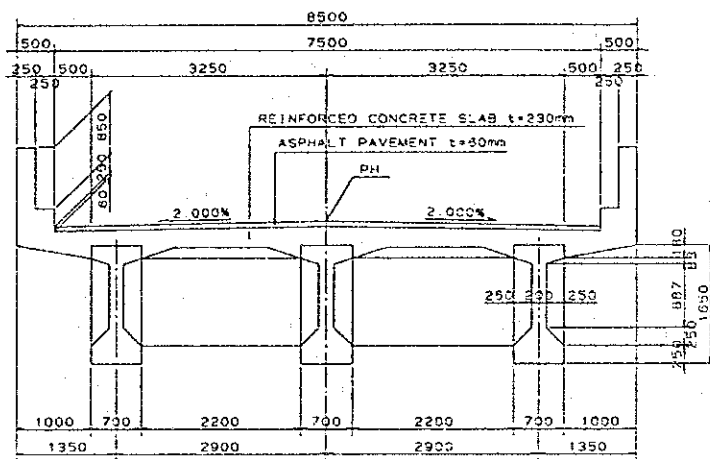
Typical Cross-section of Superstructure (Span length = 25 m)
